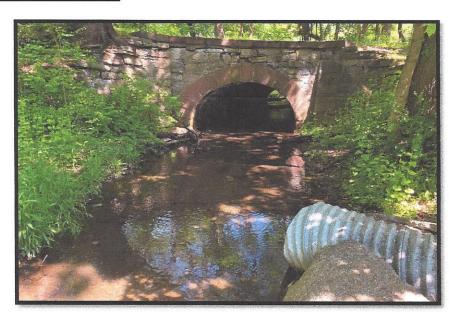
Culvert under Lebanon Valley Rail Trail.
